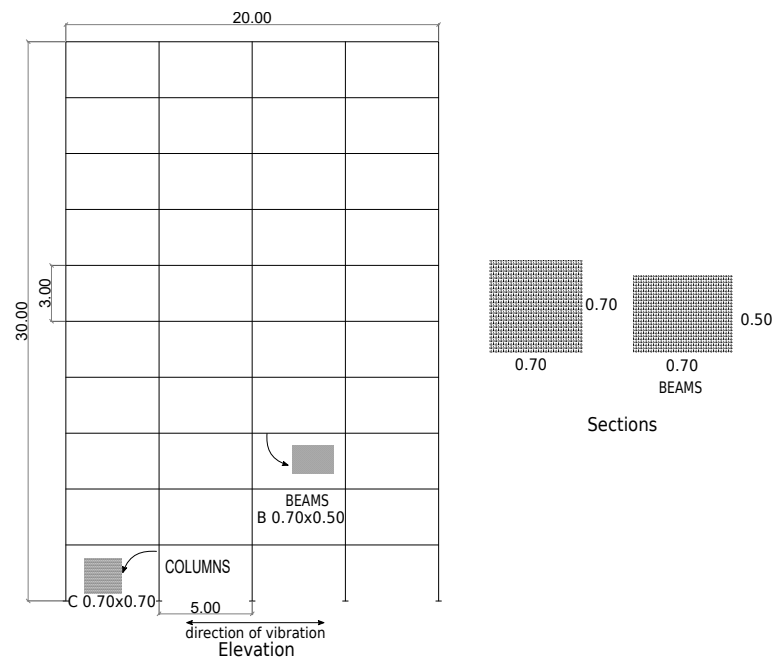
Elevation of the studied RC frame structure (all dimensions are in m).
